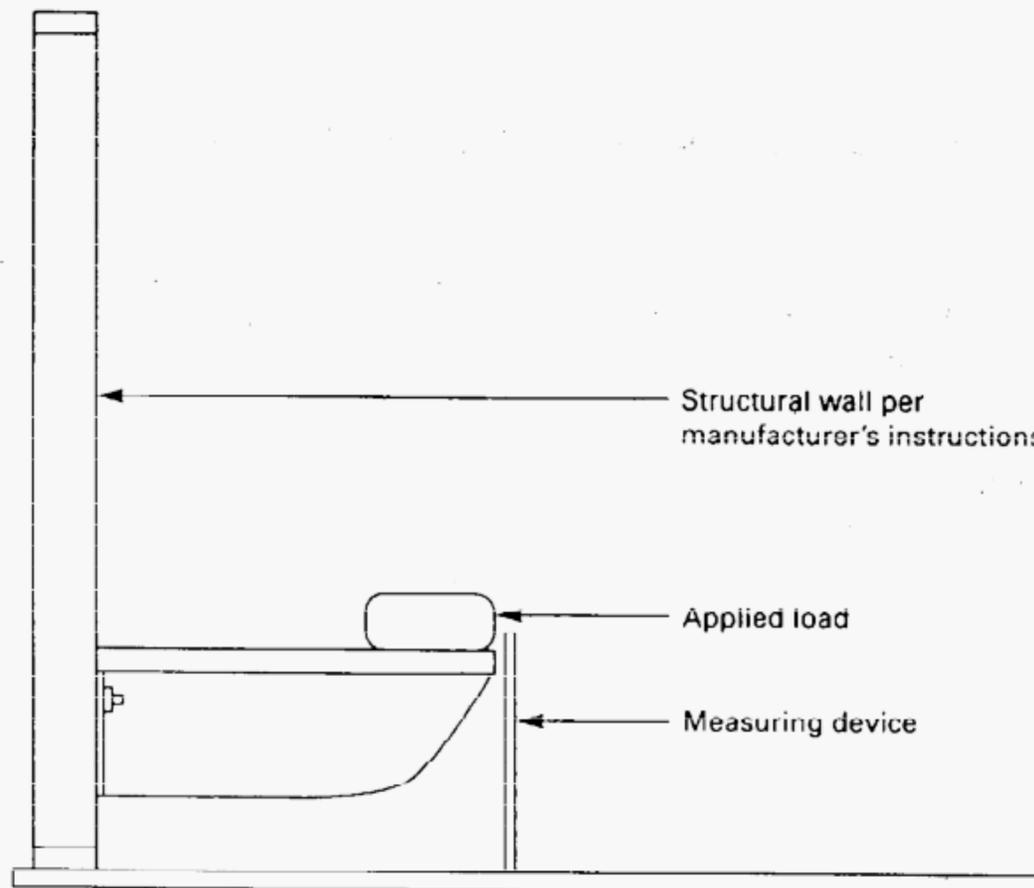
LOAD TEST ON WALL-HUNG WATER CLOSET
